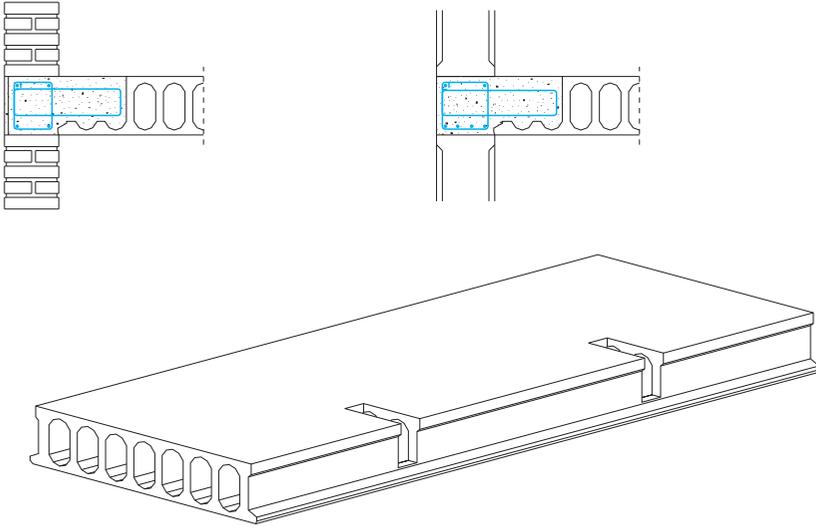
Lateral cuts in a slab without topping for hooking bar housing
